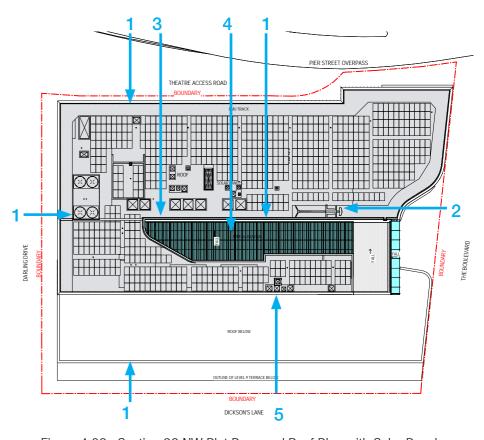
Section 96 NW Plot Proposed Roof Plan with Solar Panels
